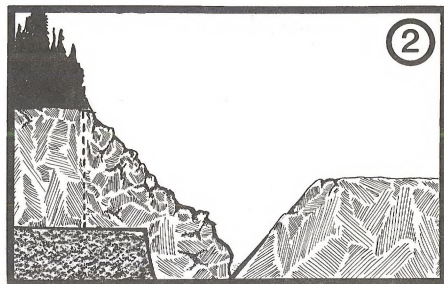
TYPICAL CANYON FILL OVERBURDEN OR SPENT SAND DISPOSAL SITE
